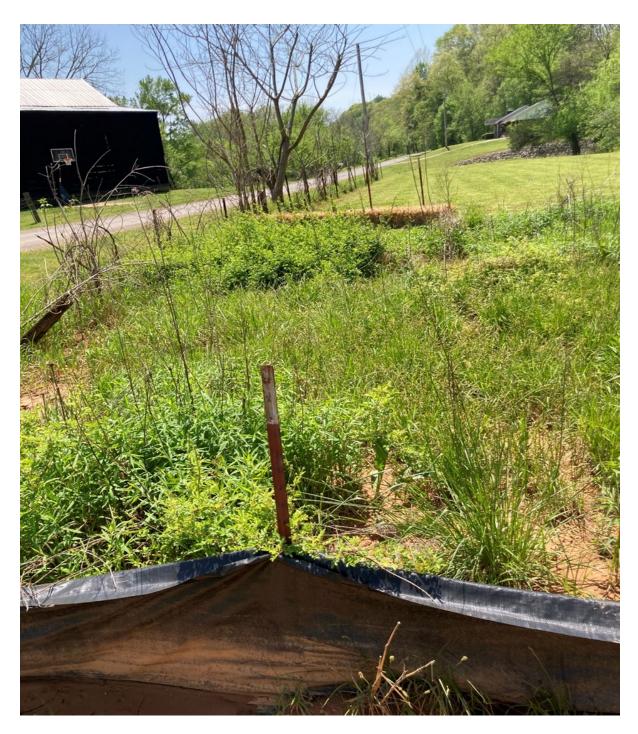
Series of BMPs at the facility entrance to treat stormwater before it leaves the site.
